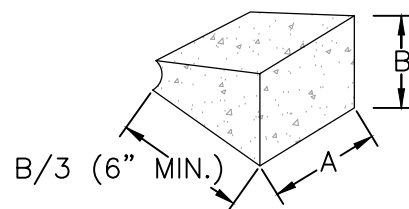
DETAIL MODIFIED FROM TOJ DETAIL W-110 1/16/13
